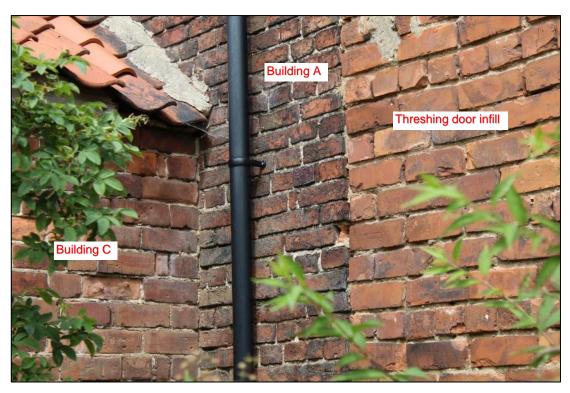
Detail of junction between eastern elevation of Building C and southern elevation of Building A
